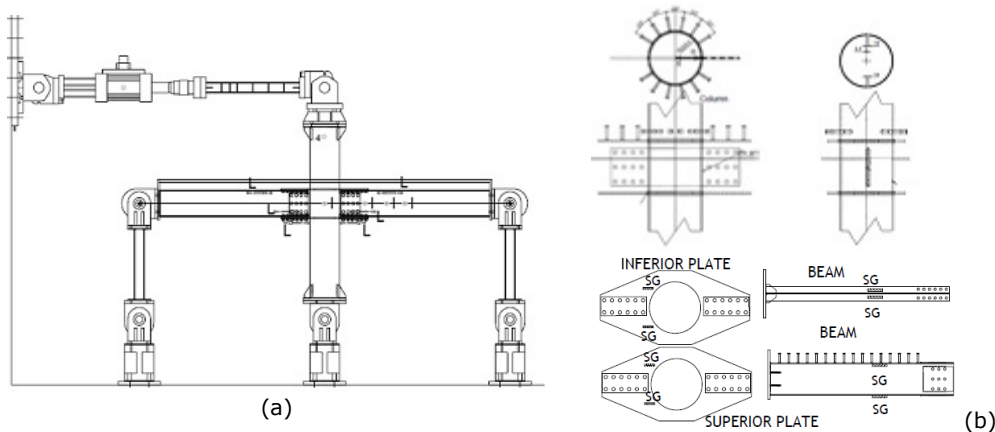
Experimental test set-up (a) and connection details of the joint (b) [67]
